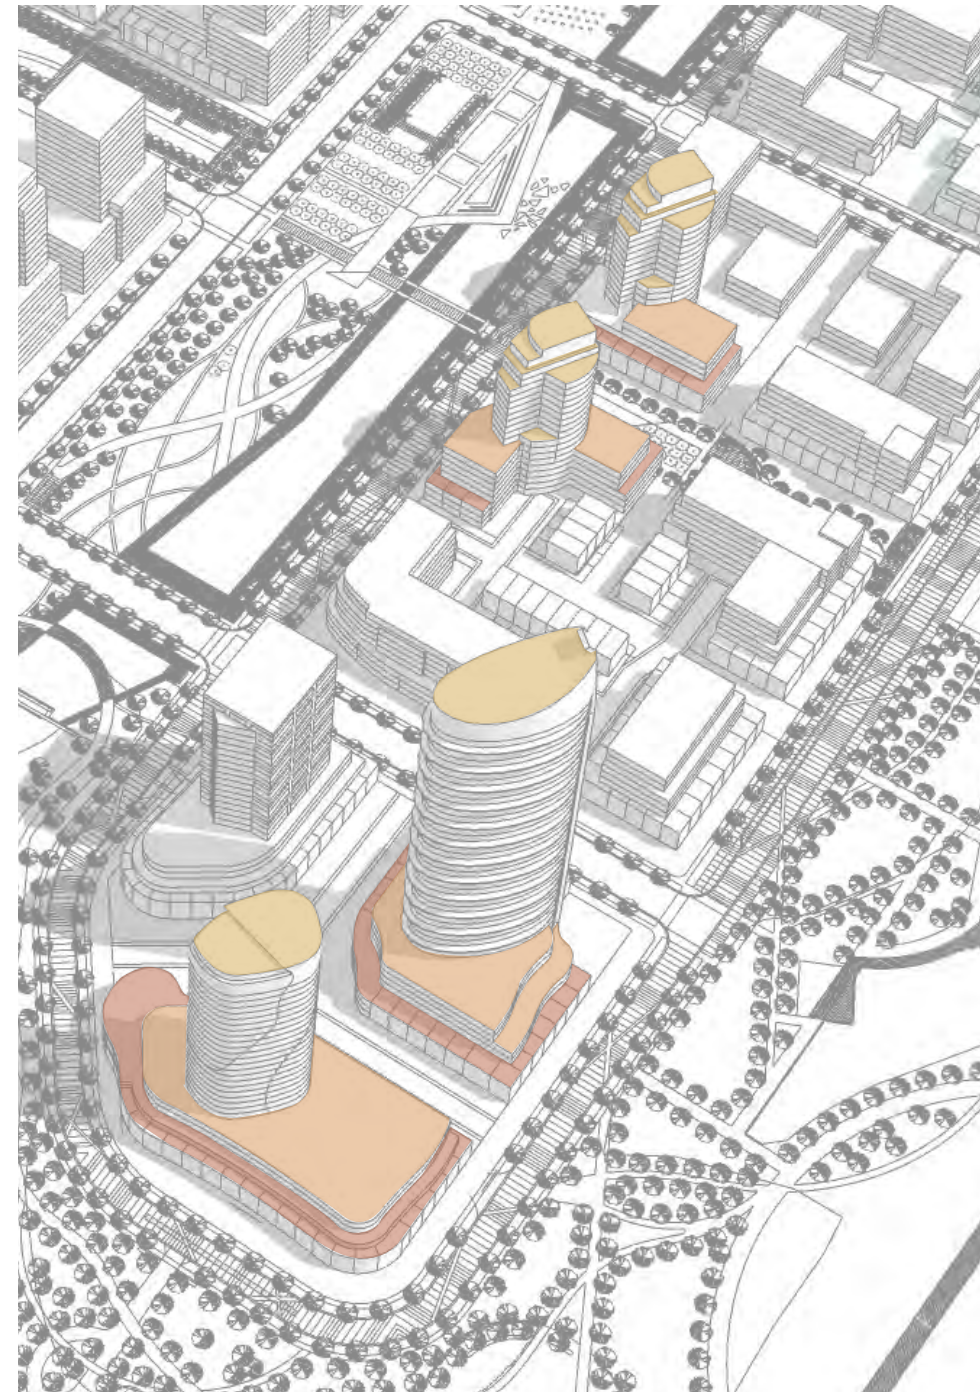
W Parking structures will to be shielded from the public realm by containing a liner use wrapping street frontages. Above grade parking within a block or a taller structure will be wrapped and not exceed taller than the height of its liner building. Human-scale elements, such as projections and recesses like stoops and canopies, create depth and shadow that enhances framing the enclosure of an “outdoor room” along the public realm.
